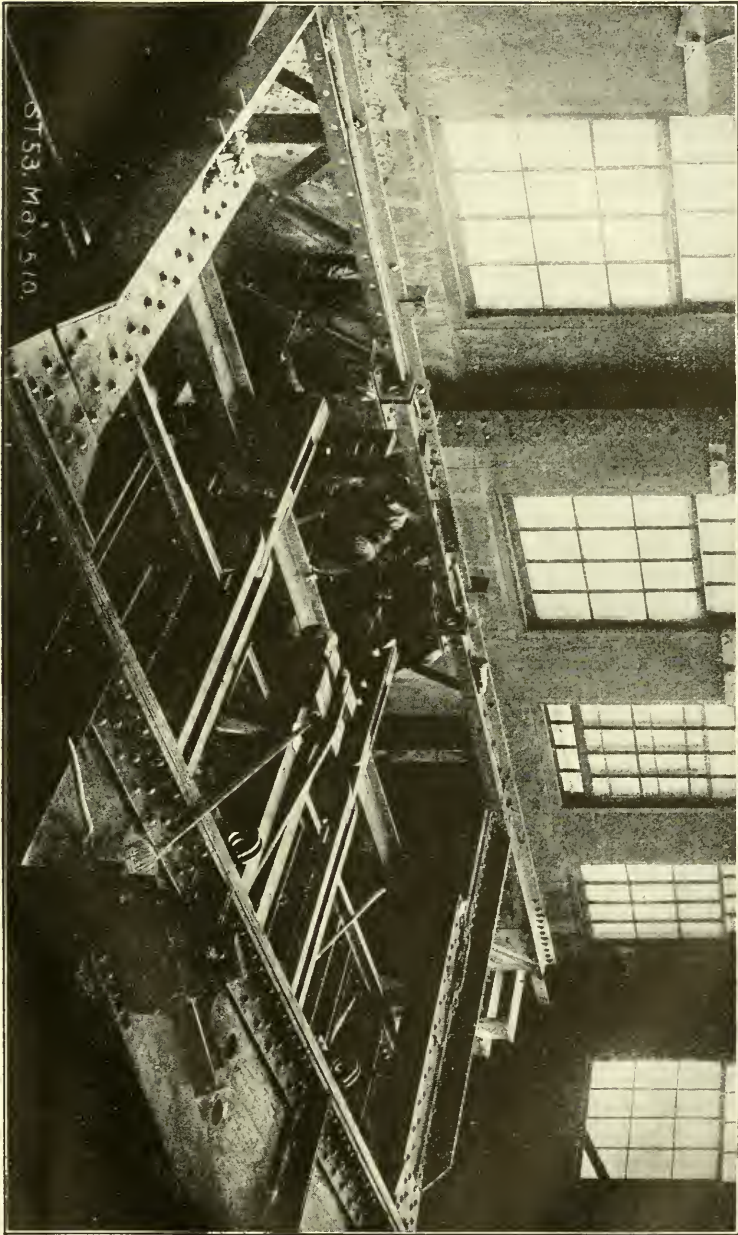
BEAM TESTING MACHINE, AS ARRANGED FOR THIRD POINT LOADING.
